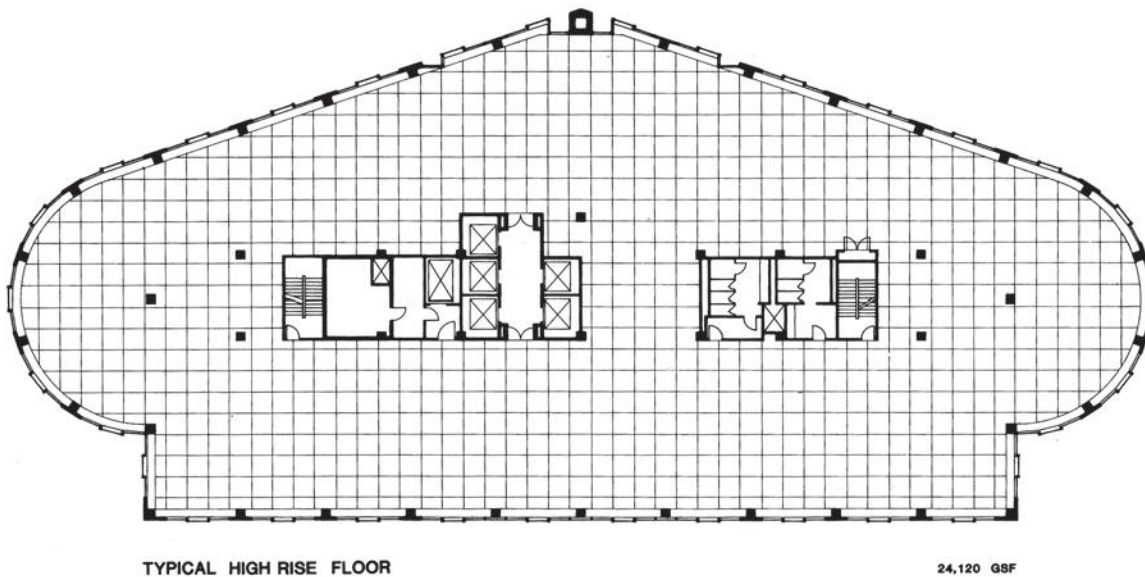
The uniquely shaped floor plan of this office building provides for some creative interior spaces not available in simple, rectangular building plans.
